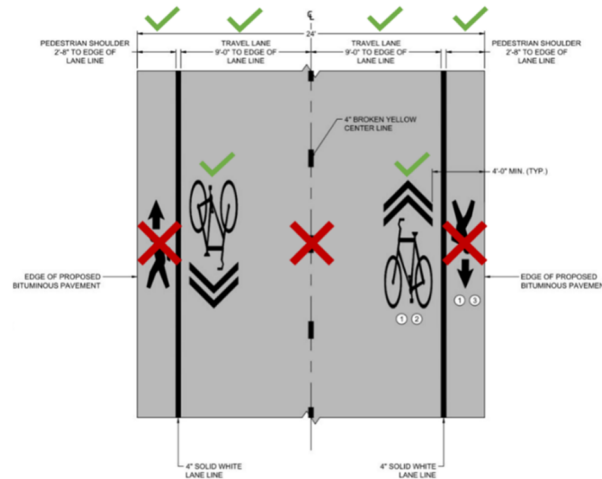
Recommended revisions to the 2022 striping plan for Peninsula Road.
